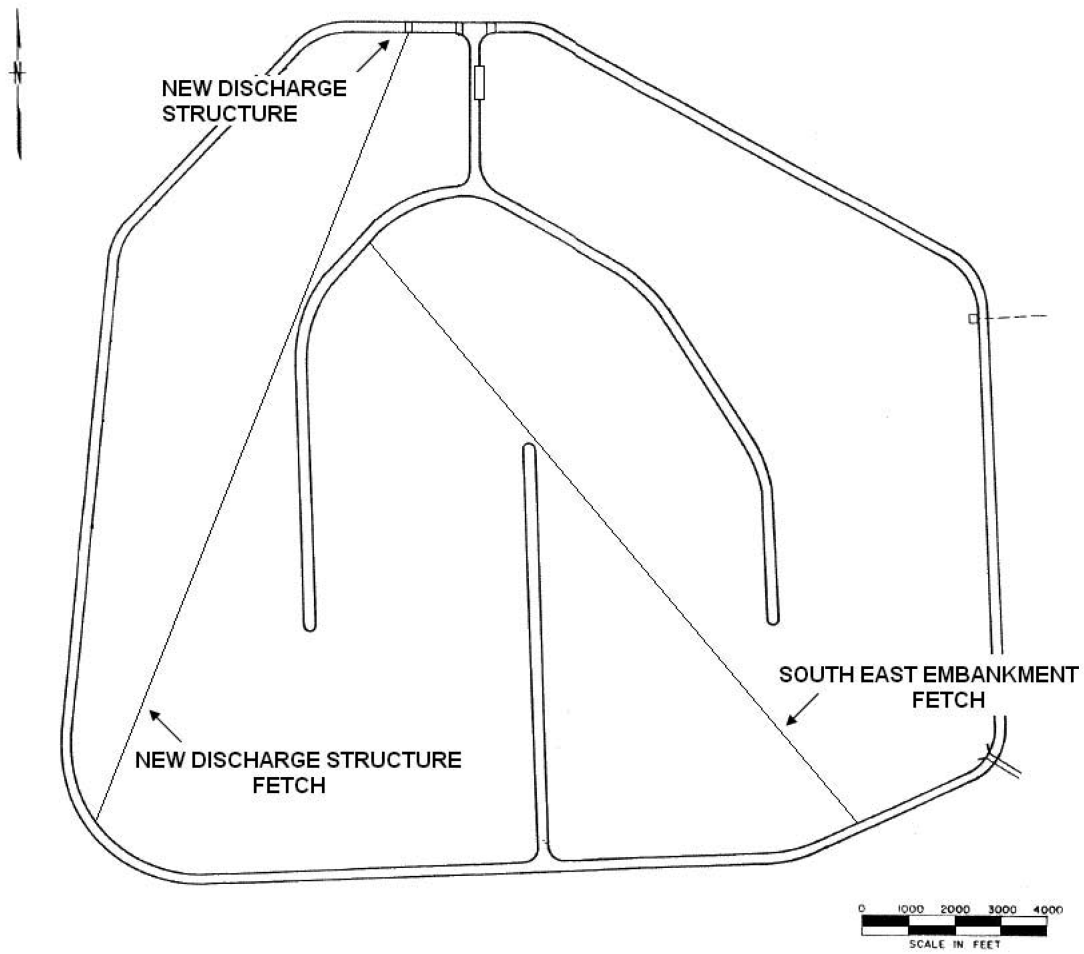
S.8-5 Determination of Fetch at the Southeast Embankment and at the New Discharge Structure
